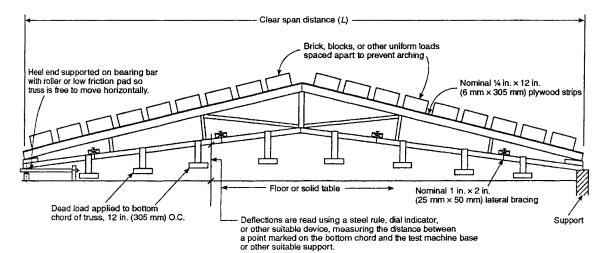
(b)(2) – Test setup for roof trusses tested in groups of two or more.
